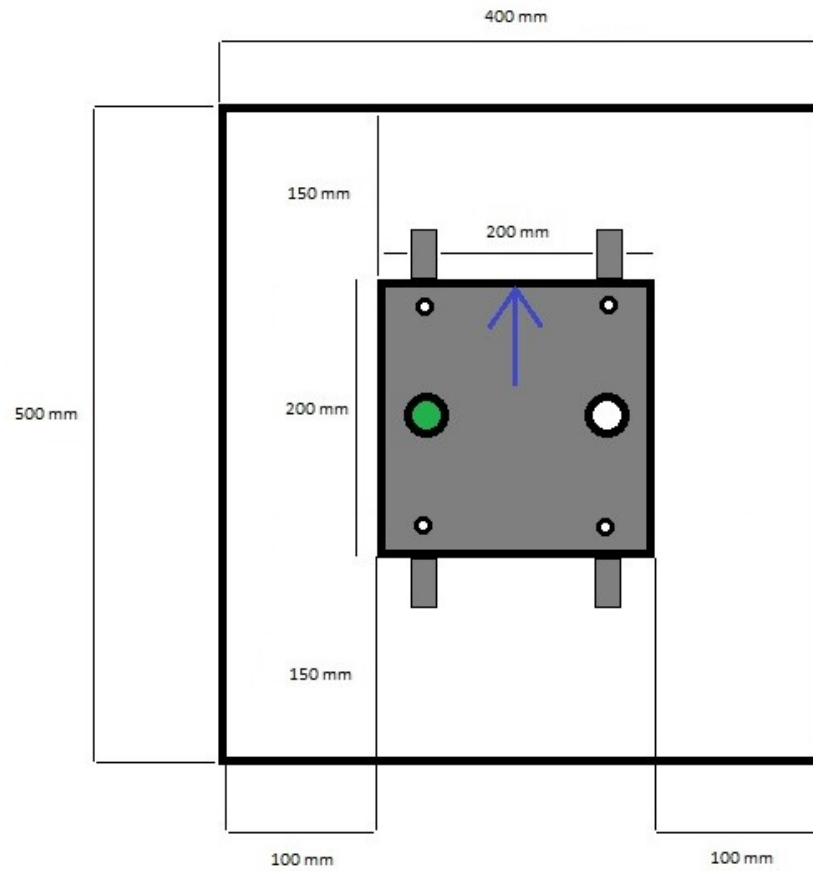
Construction pit layout with built-in underground anchor. Orientation direction of the charging station is shown with blue arrow. If the single charging station is installed on stand-alone pole, power cable must be prepared through green hole.
